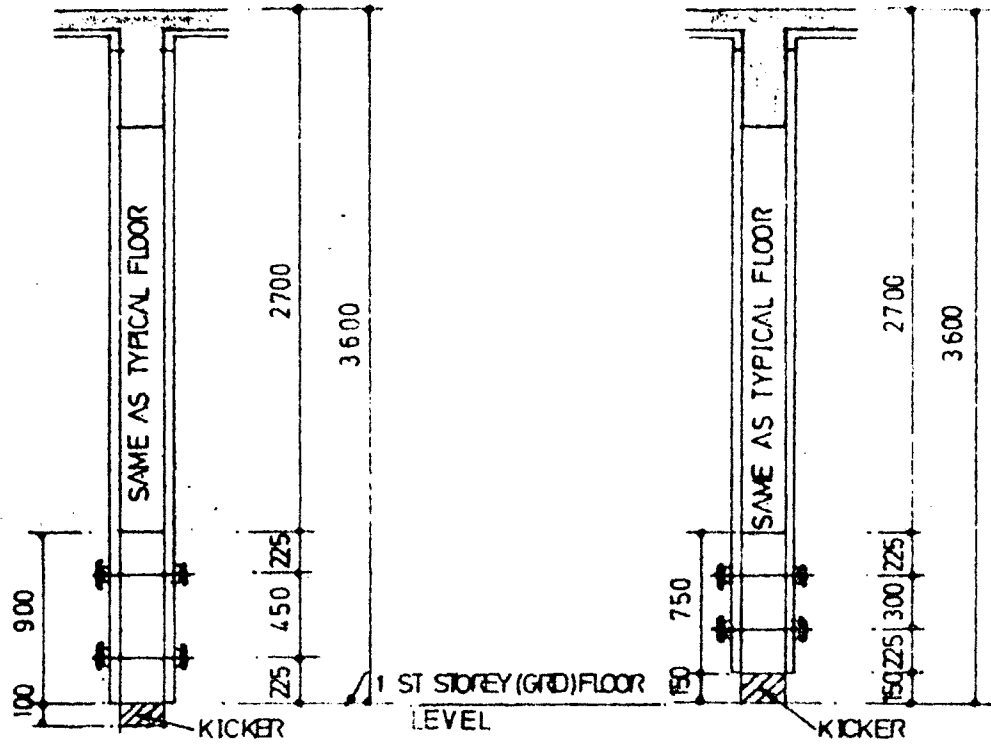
Bracing for walls, staircases & Lift shafts ( AT GROUND FLOOR )
